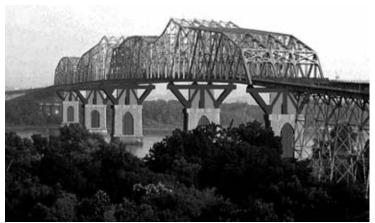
Elevation Proposed Widened Huey P. Long Bridge
